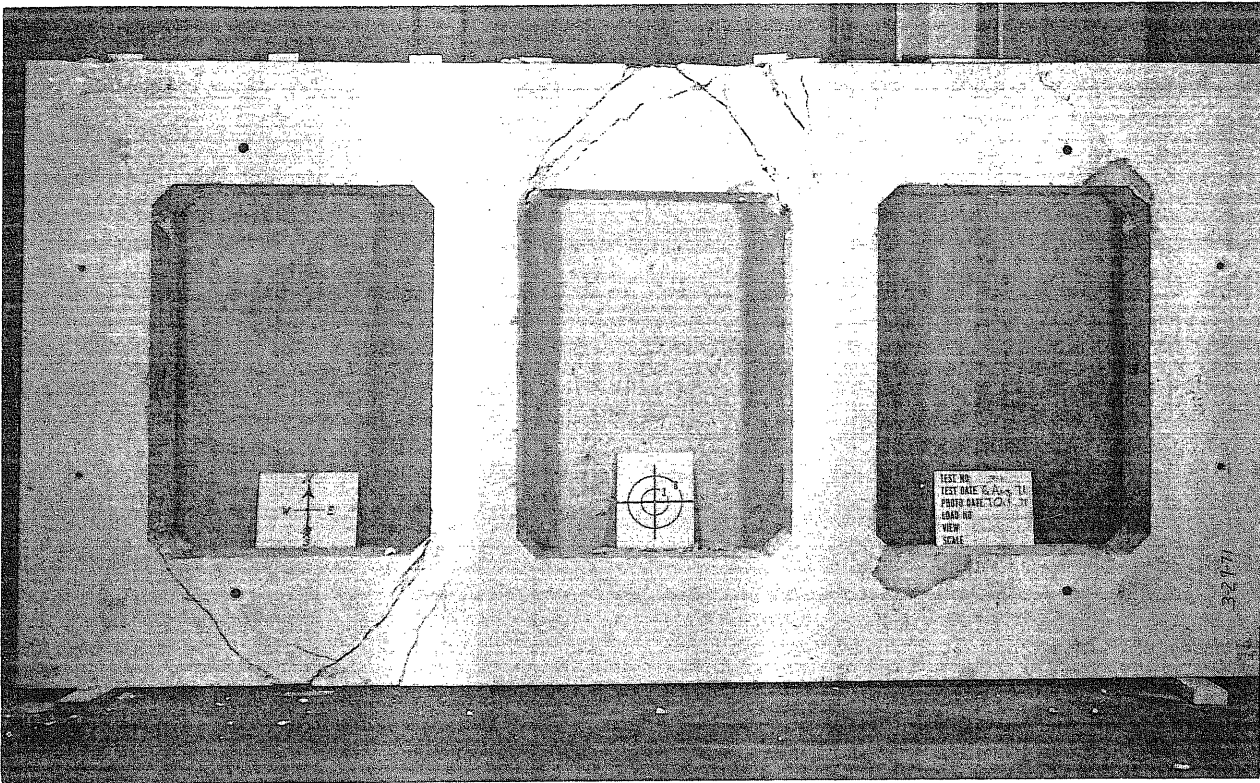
SPECIMEN R1 AFTER TEST TO FAILURE
